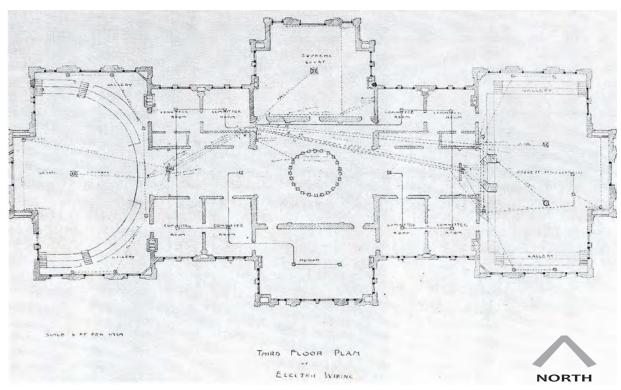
ca. 1889 Electric Wiring (Lighting) Plan
